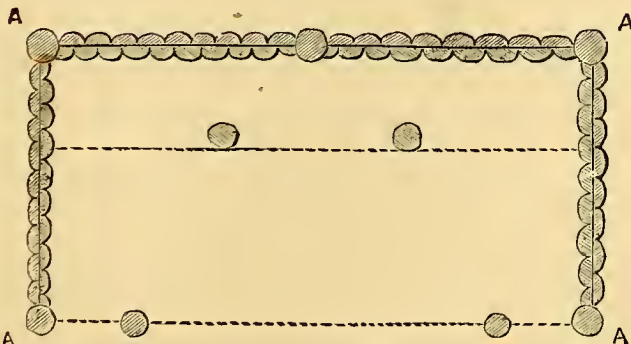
GROUND-PLAN OF SMALL SUMMER-HOUSE.
